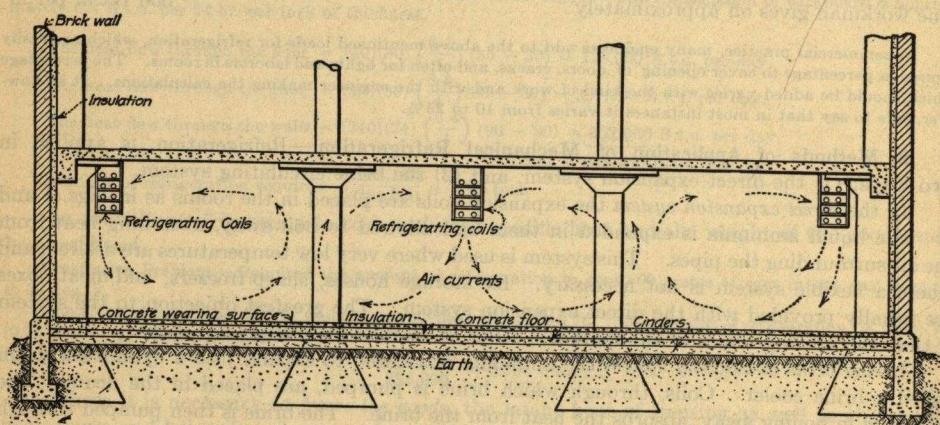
Arrangement of refrigerating coils for rooms over 30 ft. wide.
